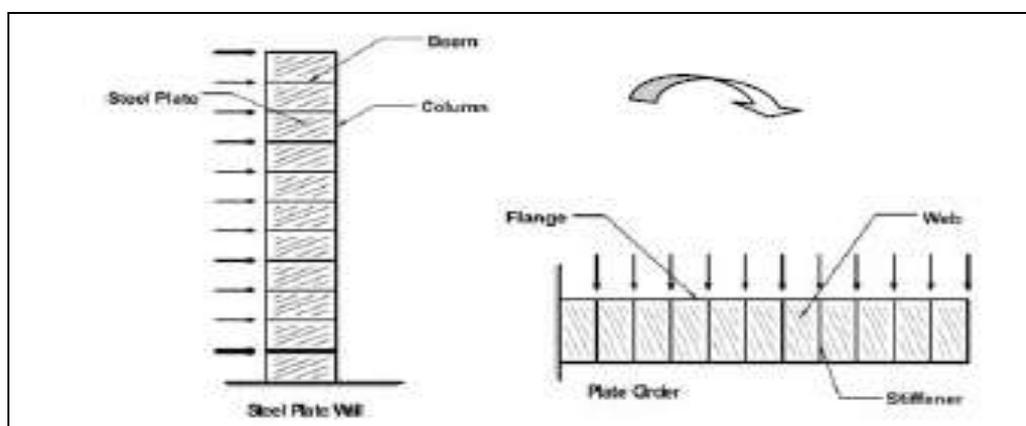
Steel Plates Shear Wall and Plate Girder Analogy
